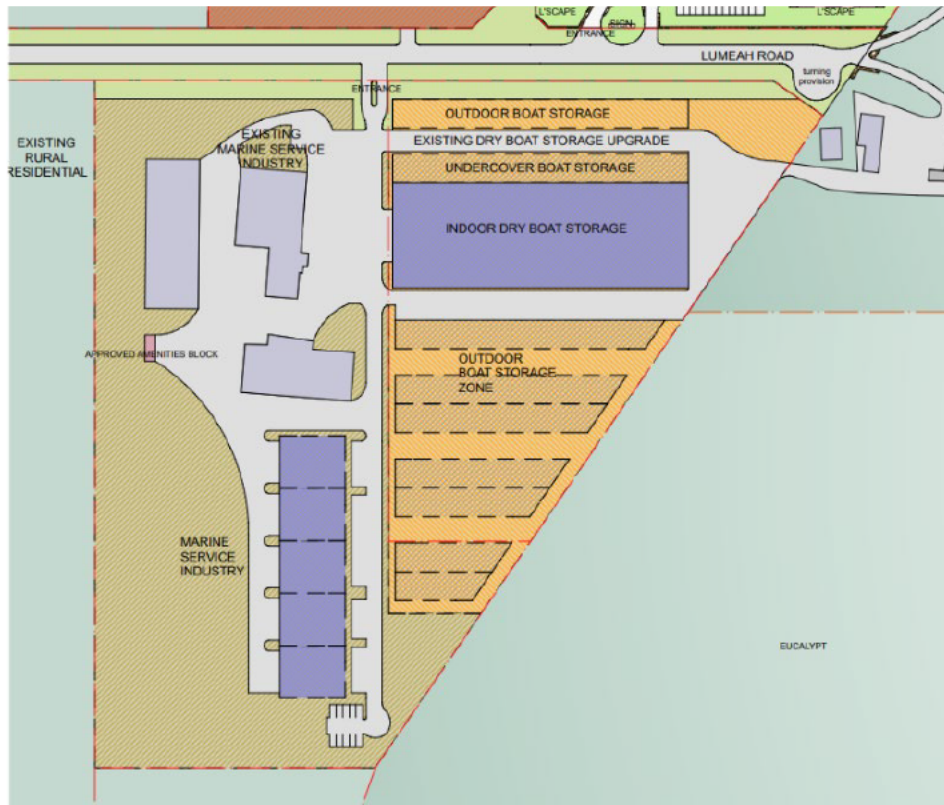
Excerpt from C09/002 decision plans of proposed marine service industry shed at 3 Lumeah Road and indoor dry boat storage shed at 1 Lumeah Road, noting that no plans have been endorsed for this later stage.
